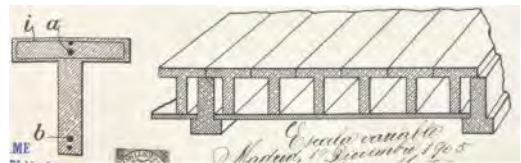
Lavanchy, Spanish patent number 37371, slab typology, 1906.
